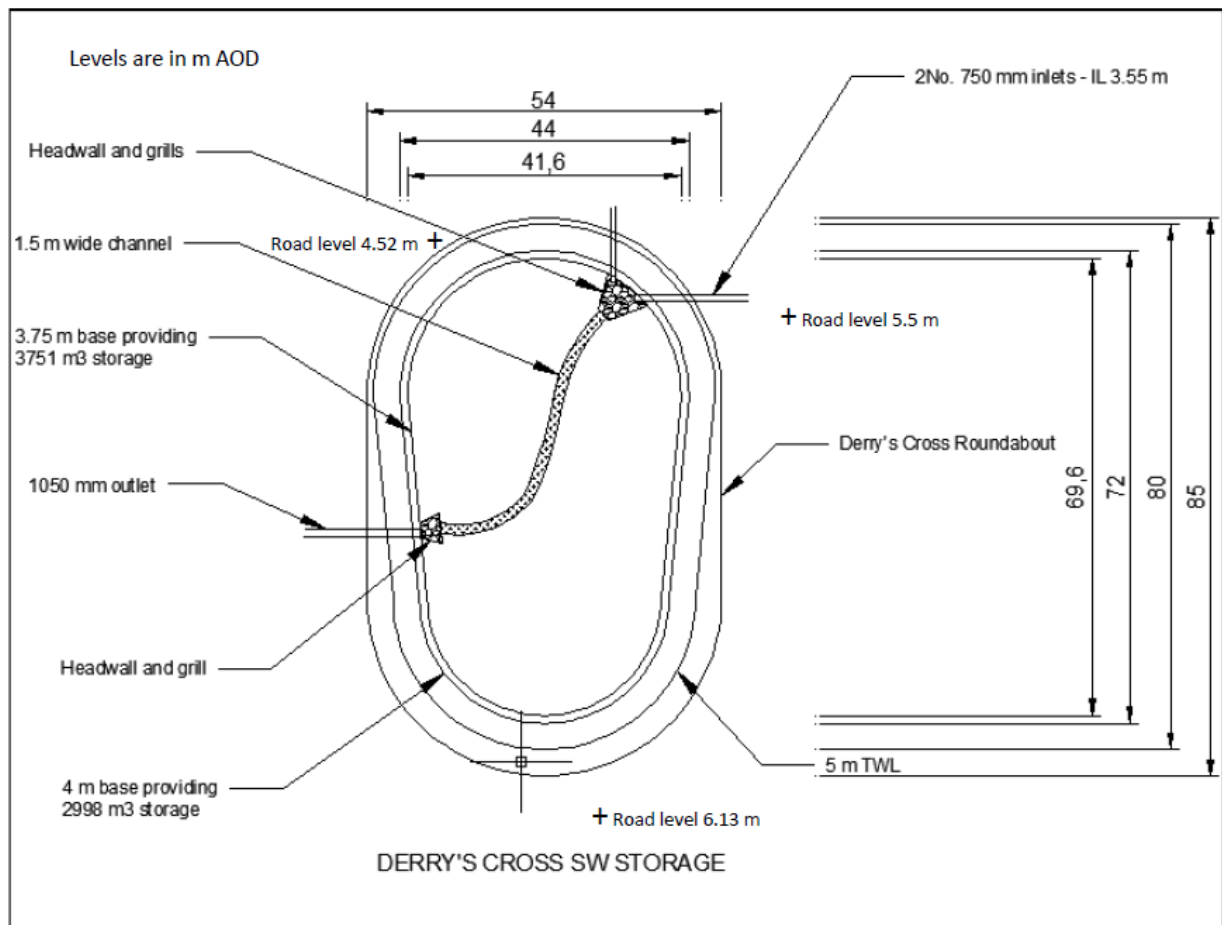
Proposed Open Pond Surface Water Storage Facility on Derry's Cross Roundabout
